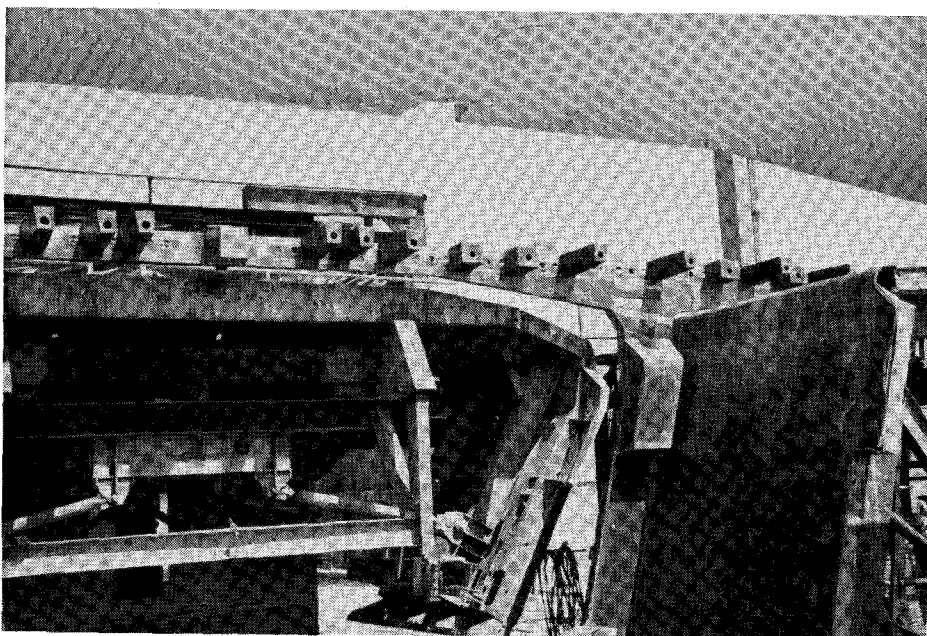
Fixed bulkhead with post-tensioning void boxes and mandrel extracted. The mandrel cantilevers through the bulkhead from an exterior support frame upon which it can be rolled in or out of the segment for cleaning.
